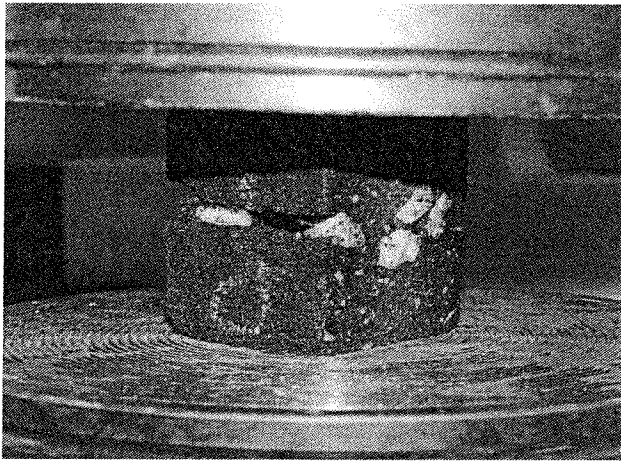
Test specimen used in tensile adhesion test glued to the machine platens.
